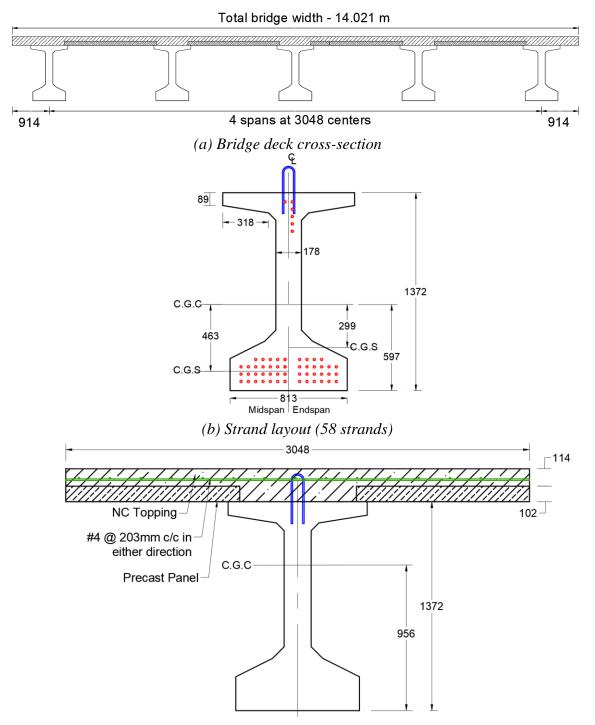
presents the cross-sections for the benchmark bridge design (Design 1). The 6-NC-girder span consists of 4-inch precast prestressed panels with a 4.5-inch site-cast NC-deck slab. The normal concrete (NC) strengths are 8.5 ksi and 4 ksi for the girder and deck topping respectively. Figure 3-1(a) shows the bridge deck cross section and Figure 3-1(b) shows the detailed strand layout. The cross-section has 52 strands with 8 of them harped at a third of the span (40-ft). Figure 3-1(c) shows the composite section with precast prestressed panels and slab reinforcement. The site-cast deck has #4 rebars spaced at 8-inches as slab reinforcement running in either direction. This Design 1 is herein referred to as: 6-NC girders, 4-inch pcp plus 4.5-inch NC-topping.
